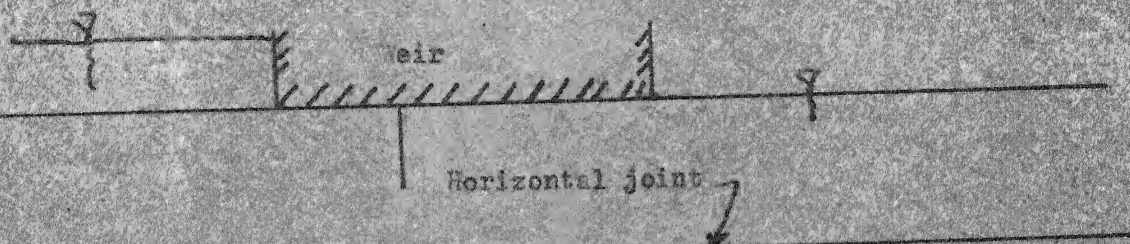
(a) Weir founded on rock foundation with horizontal joint.
